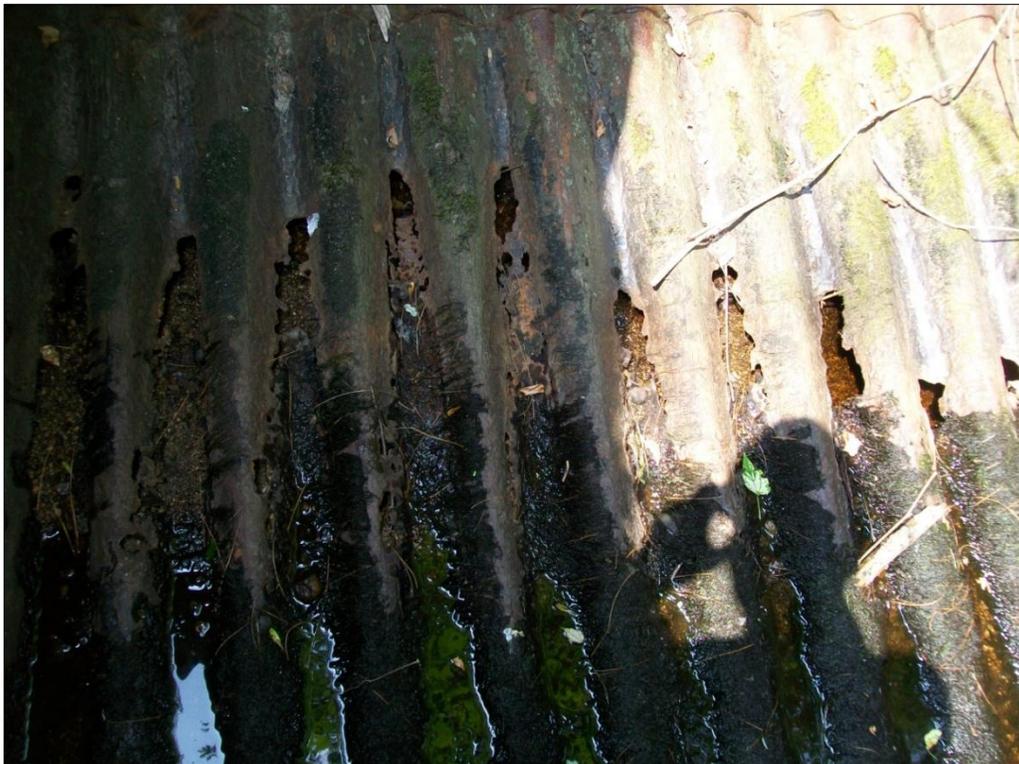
Looking Down: Corrosion in Culvert Floor
